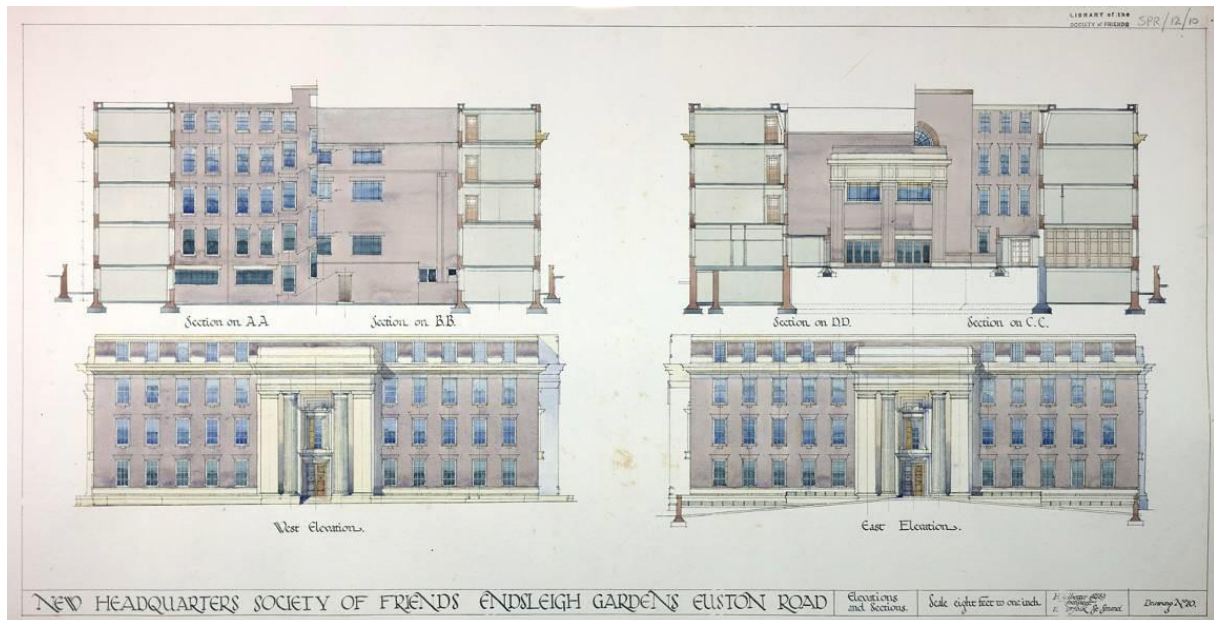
Lidbetter's design for the two short elevations and two sections, c.1927 (Friends House Library)
